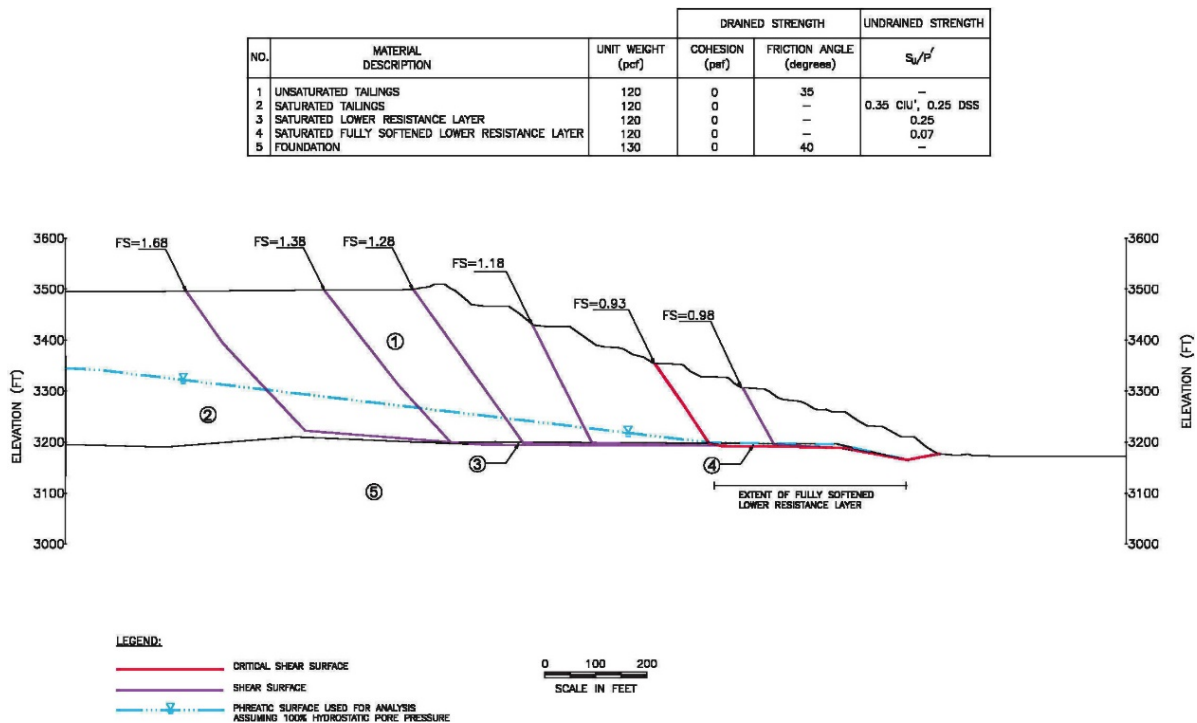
Section 10, STI elevation 3,510 feet amsl, undrained stability results without buttress
